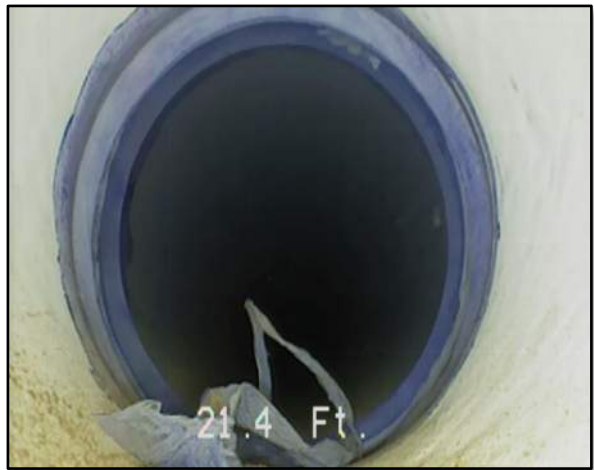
STA 00+21: Excess weld material at the seam.
